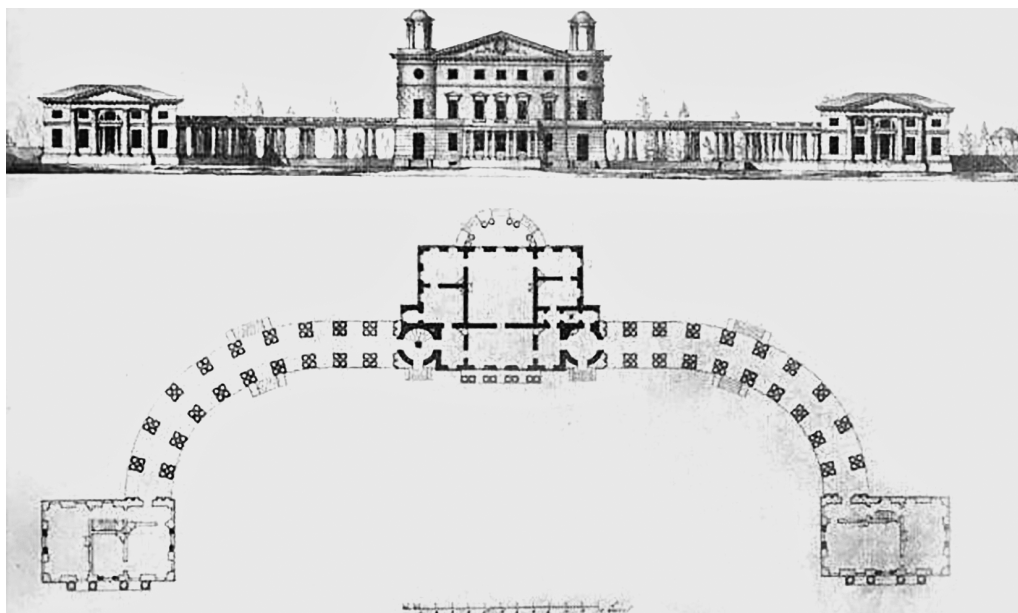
Drawing and plan of the first floor of Count Kushelev-Bezborodko's dacha [38]
